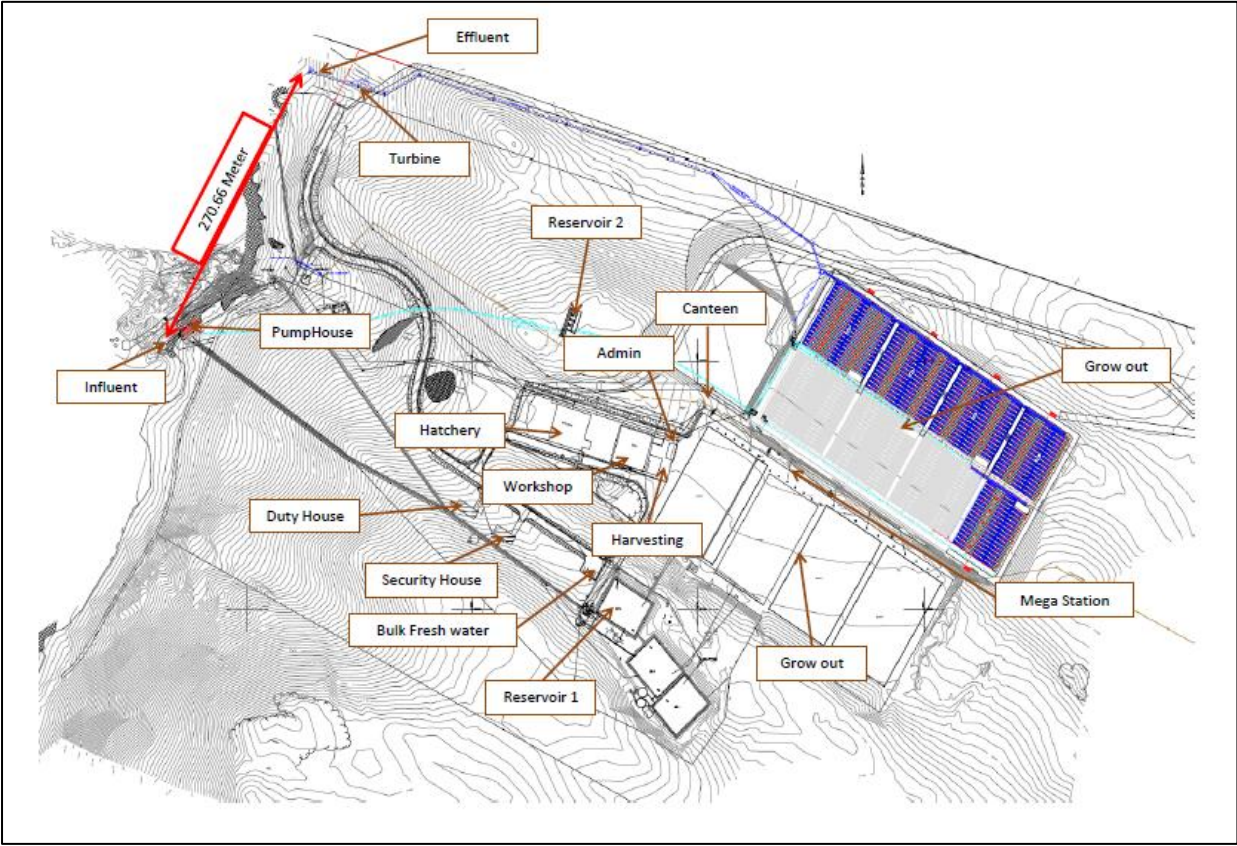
Site plan as of 2022 excluding 2025 expansion application
